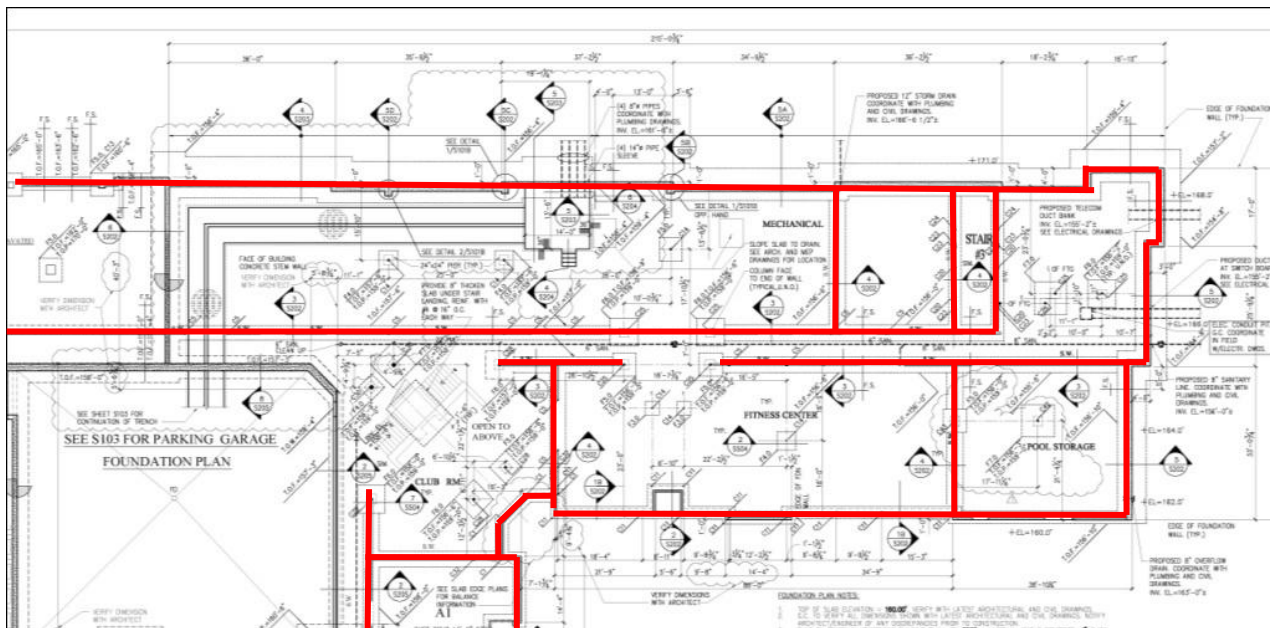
Foundation Plan, Part of the East wing. See Appendix A for more plans
